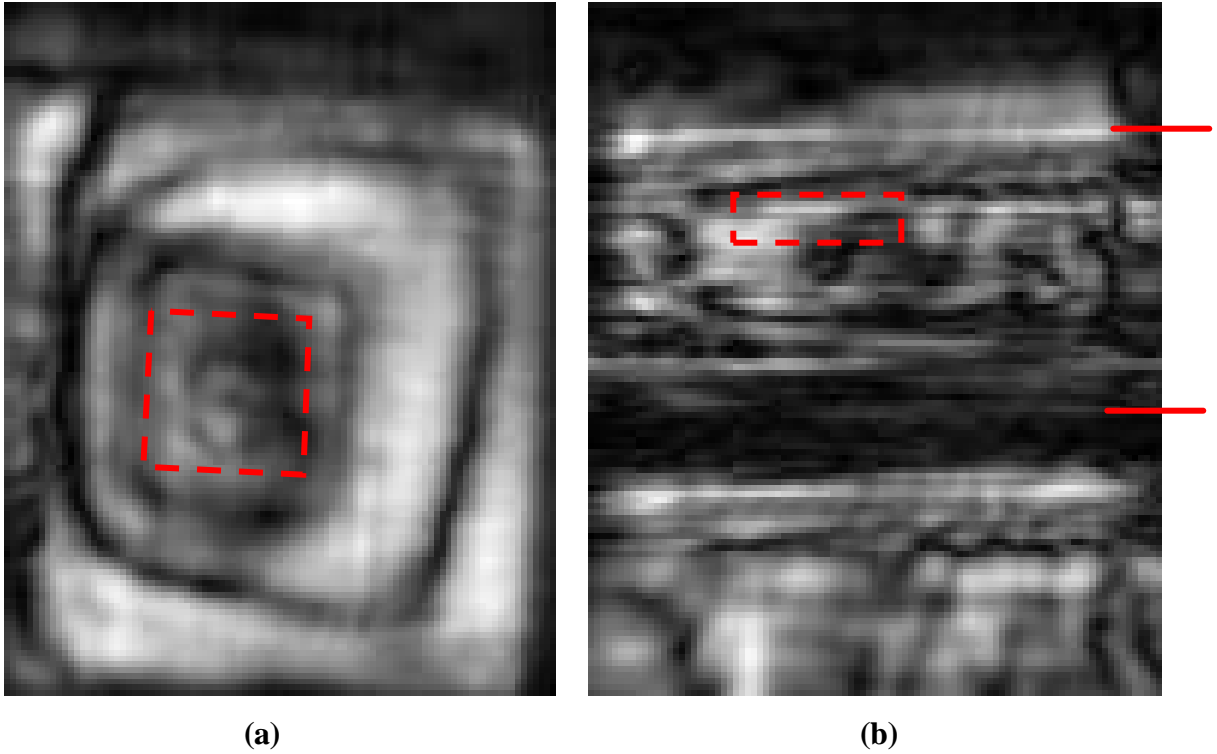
PERES II results from a simulated concrete crack specimen with a minimized air gap. (a) Plan view image of reconstructed data (b) elevation view of reconstructed data.
